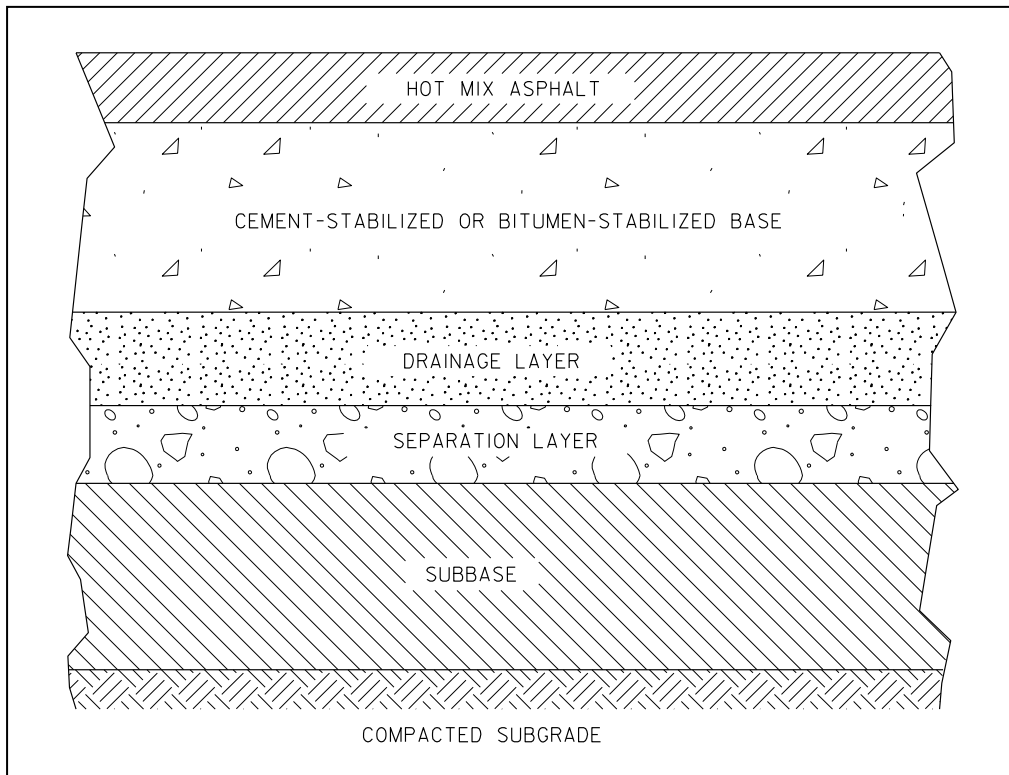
Typical All-Bituminous Concrete Pavement, Army and Air Force
